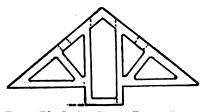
Cast Brace-Block for Howe Truss Spans under 100 ft.
